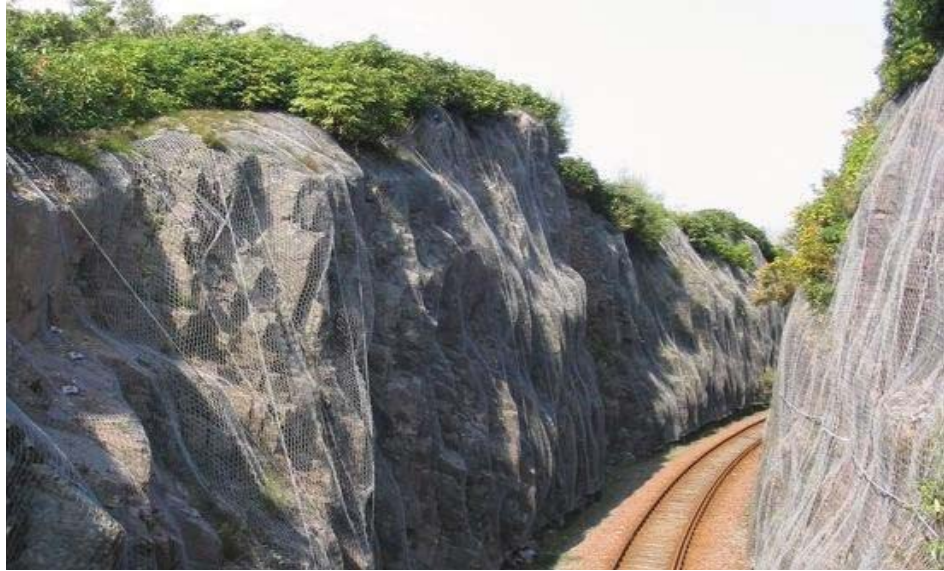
Rockfall netting used to protect equipment from falling rocks
